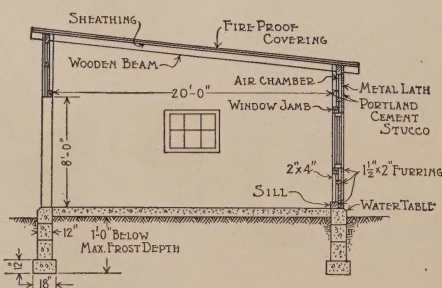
Cross section of stucco garage with concrete floor and foundation. Framework is of 2-by-4 wood studs covered with metal lath.
